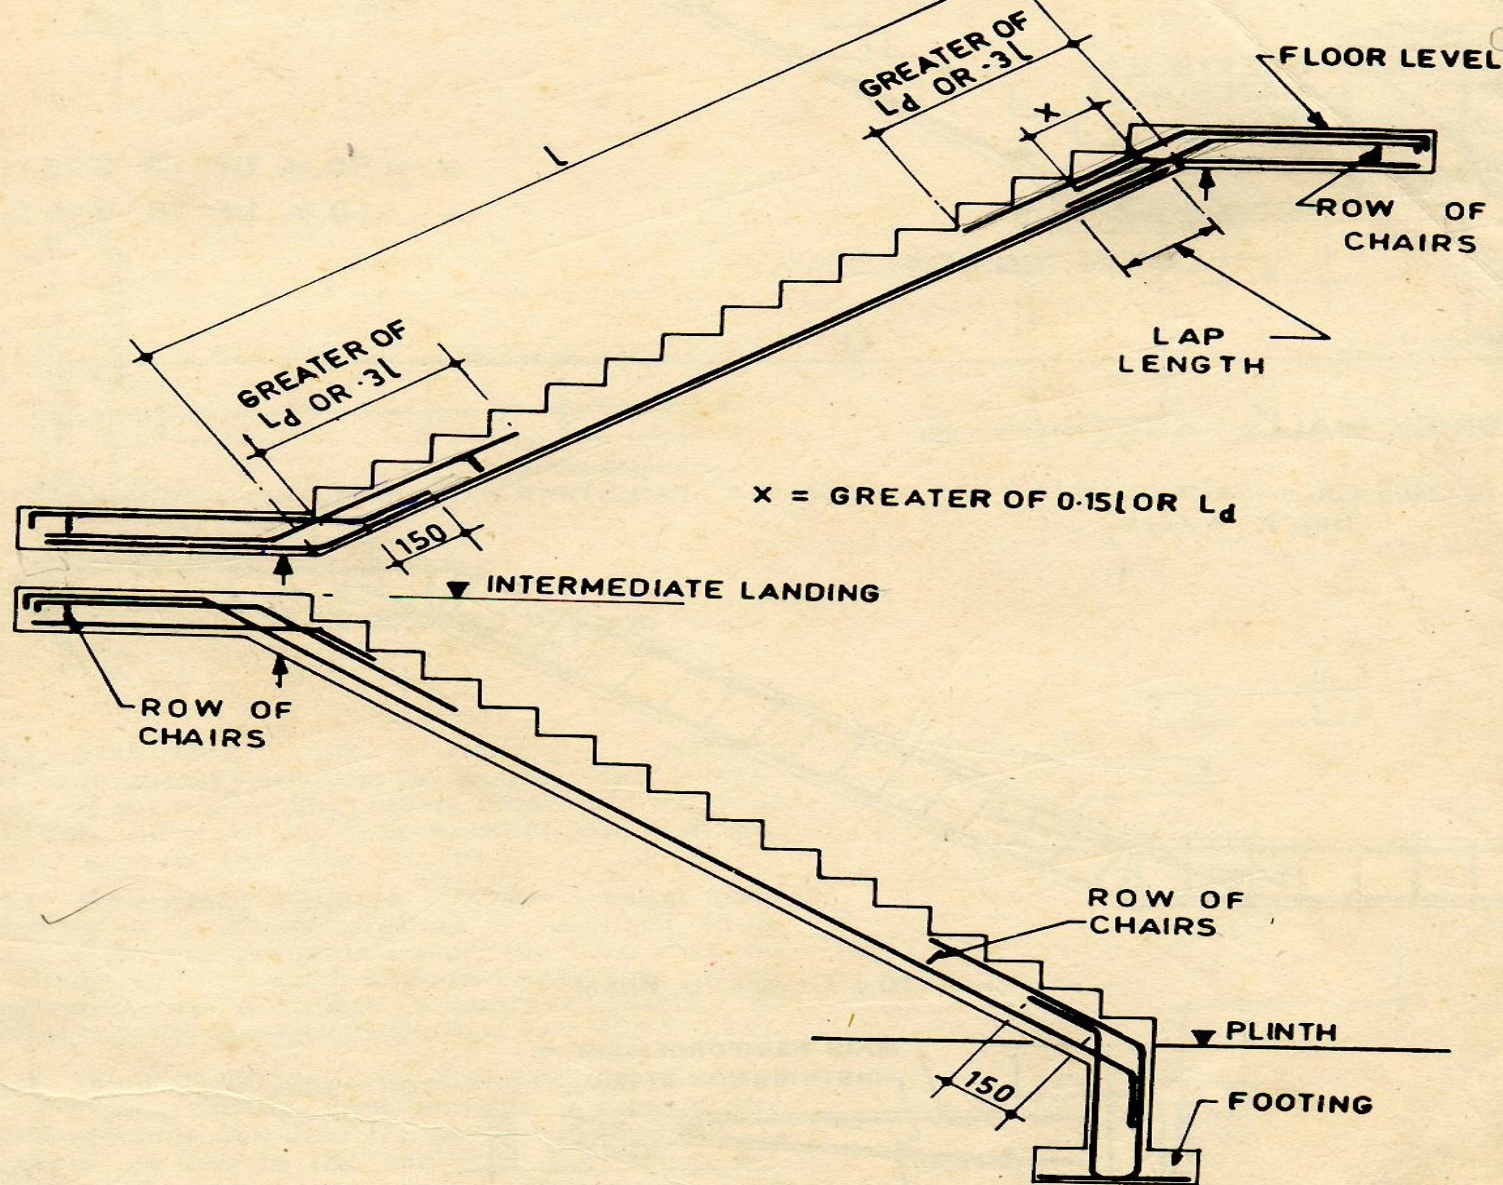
STAIRS SUPPORTED AT ENDS OF FLIGHTS—SHOWING MAIN REINFORCEMENT
